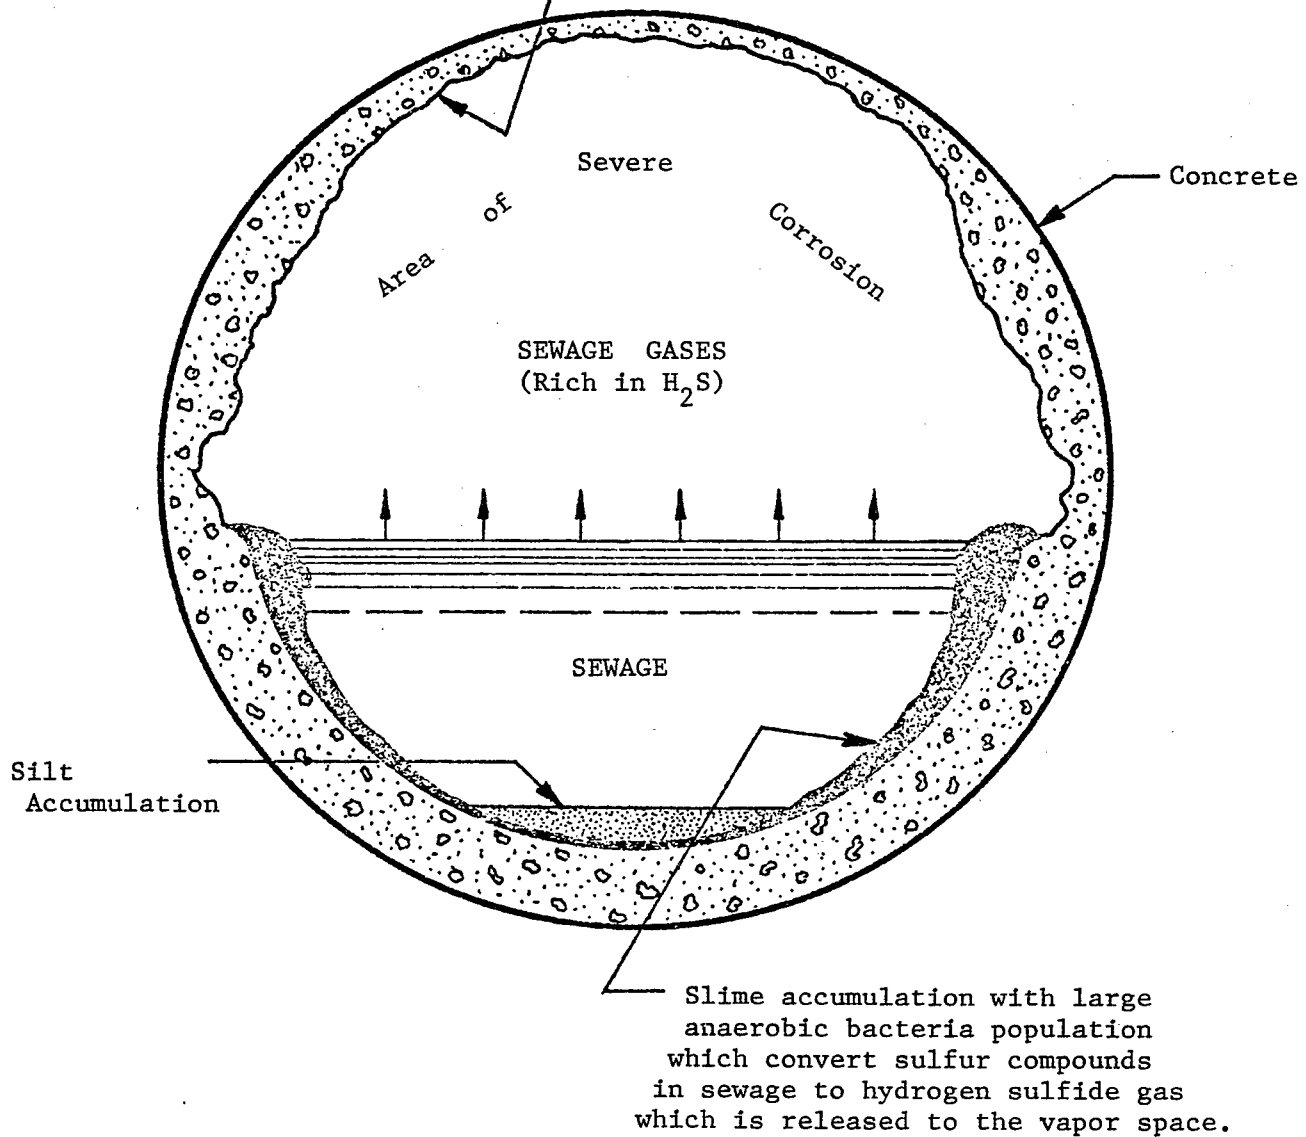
Cross section of concrete sewer pipe under typical corrosion conditions.
